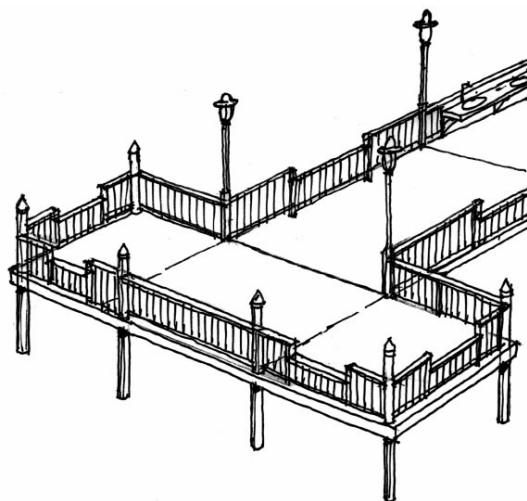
A (left). Sketch showing a typical “T” configuration at the end of a pier. (from Accessible Fishing Piers & Platforms)
